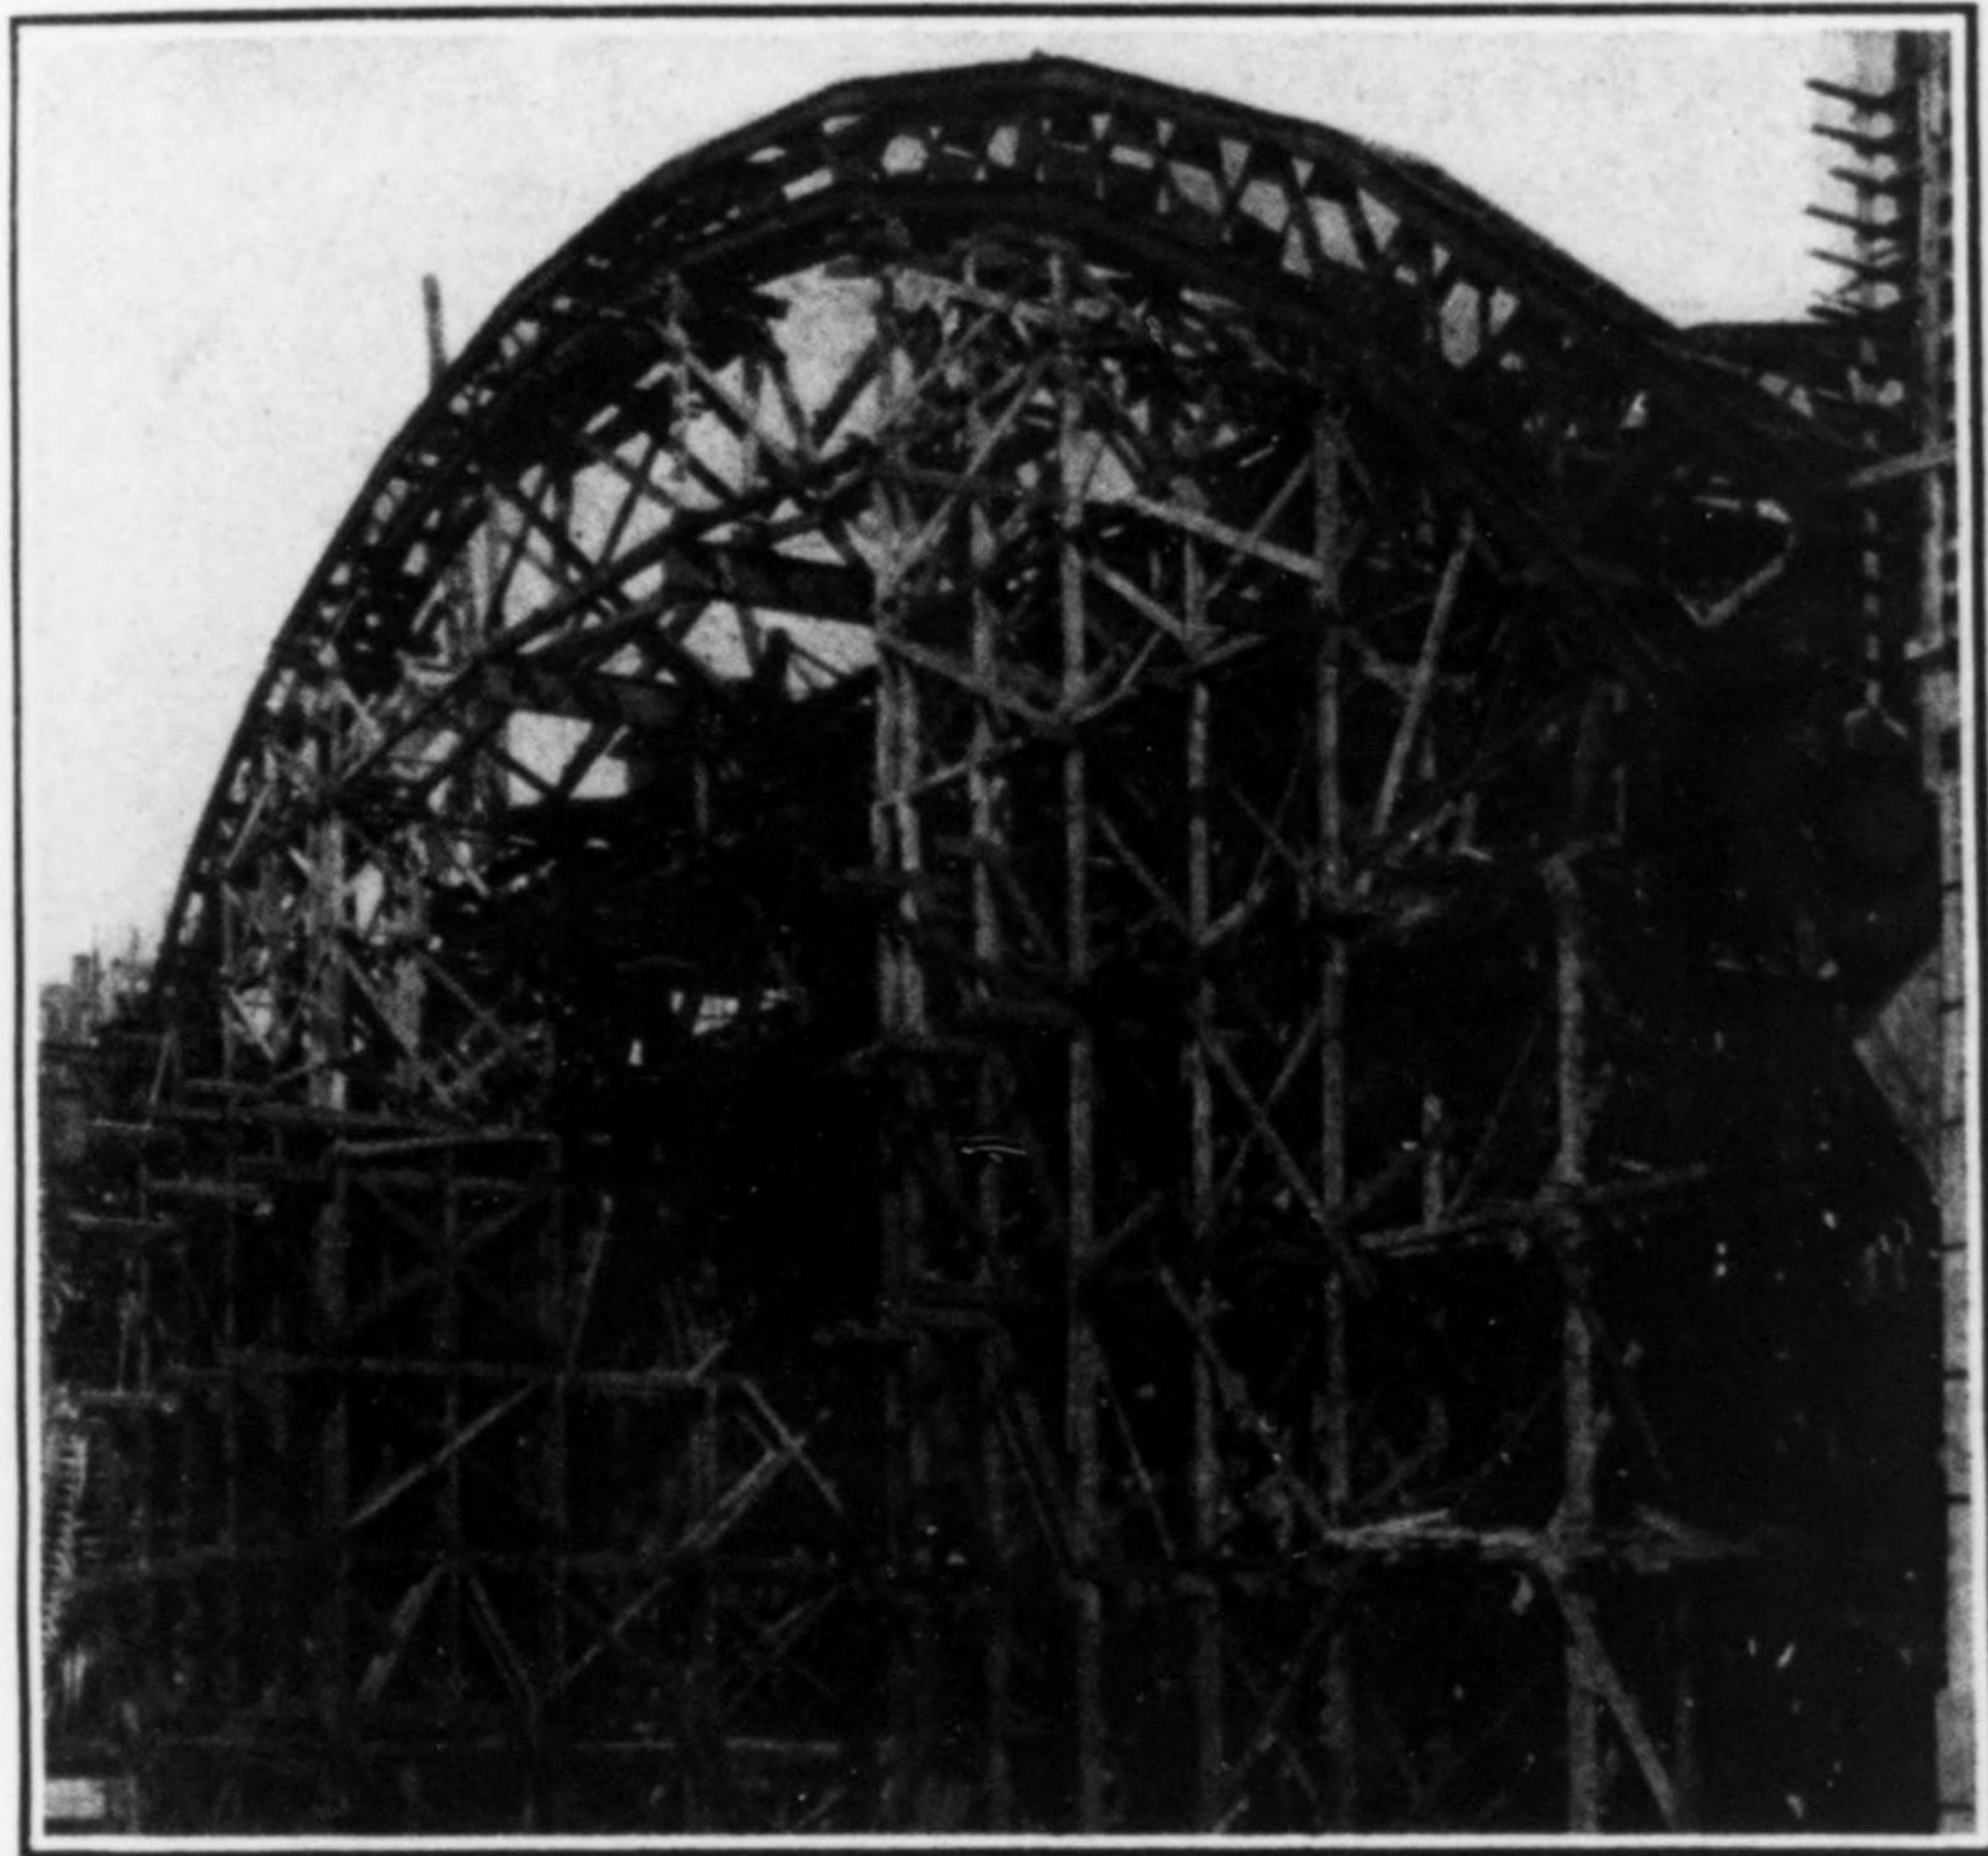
STEEL RIB ERECTED FOR 264-FT. CONCRETE ARCH
